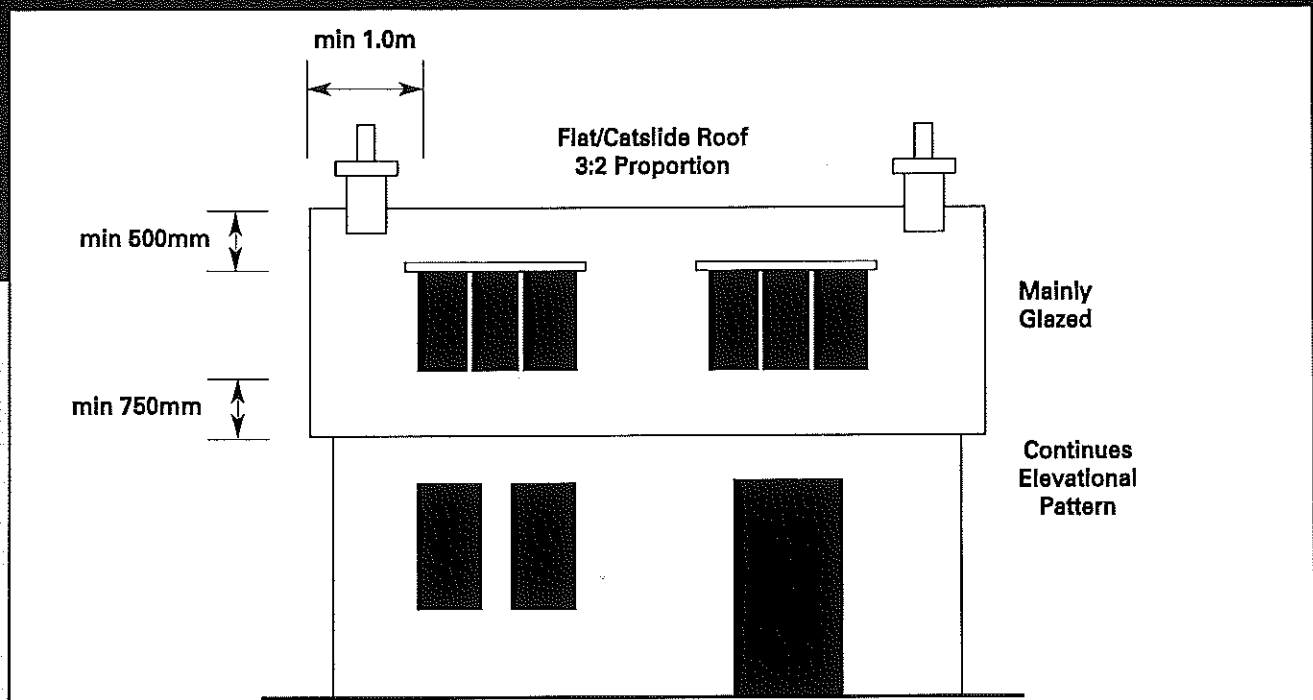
BOX DORMERS - Dimensional/elevational constraints where applicable
